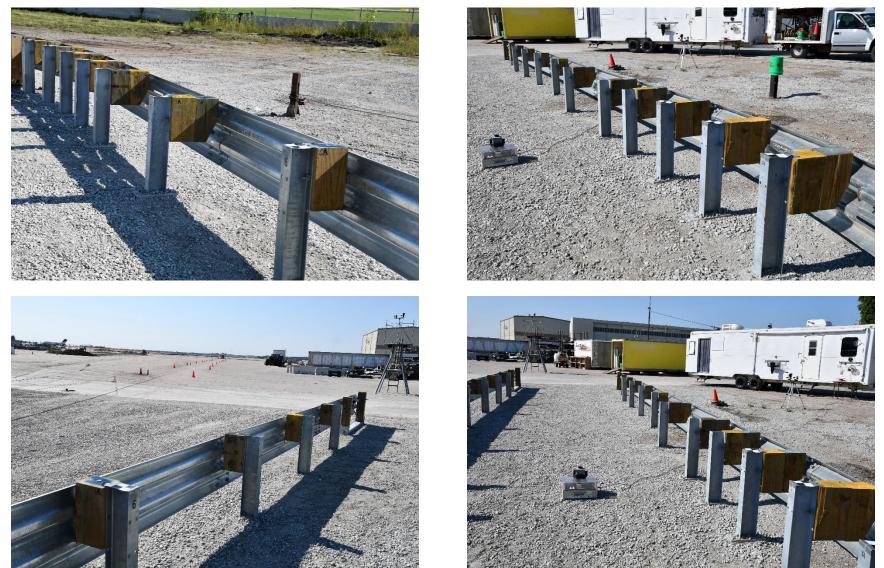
Test Installation Photographs, Post Details, Test No. MSPBN-8
